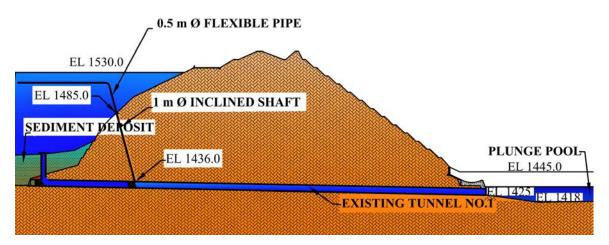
Longitudinal section of HSRS layout with existing tunnel No. 1 (Alternative 1)
